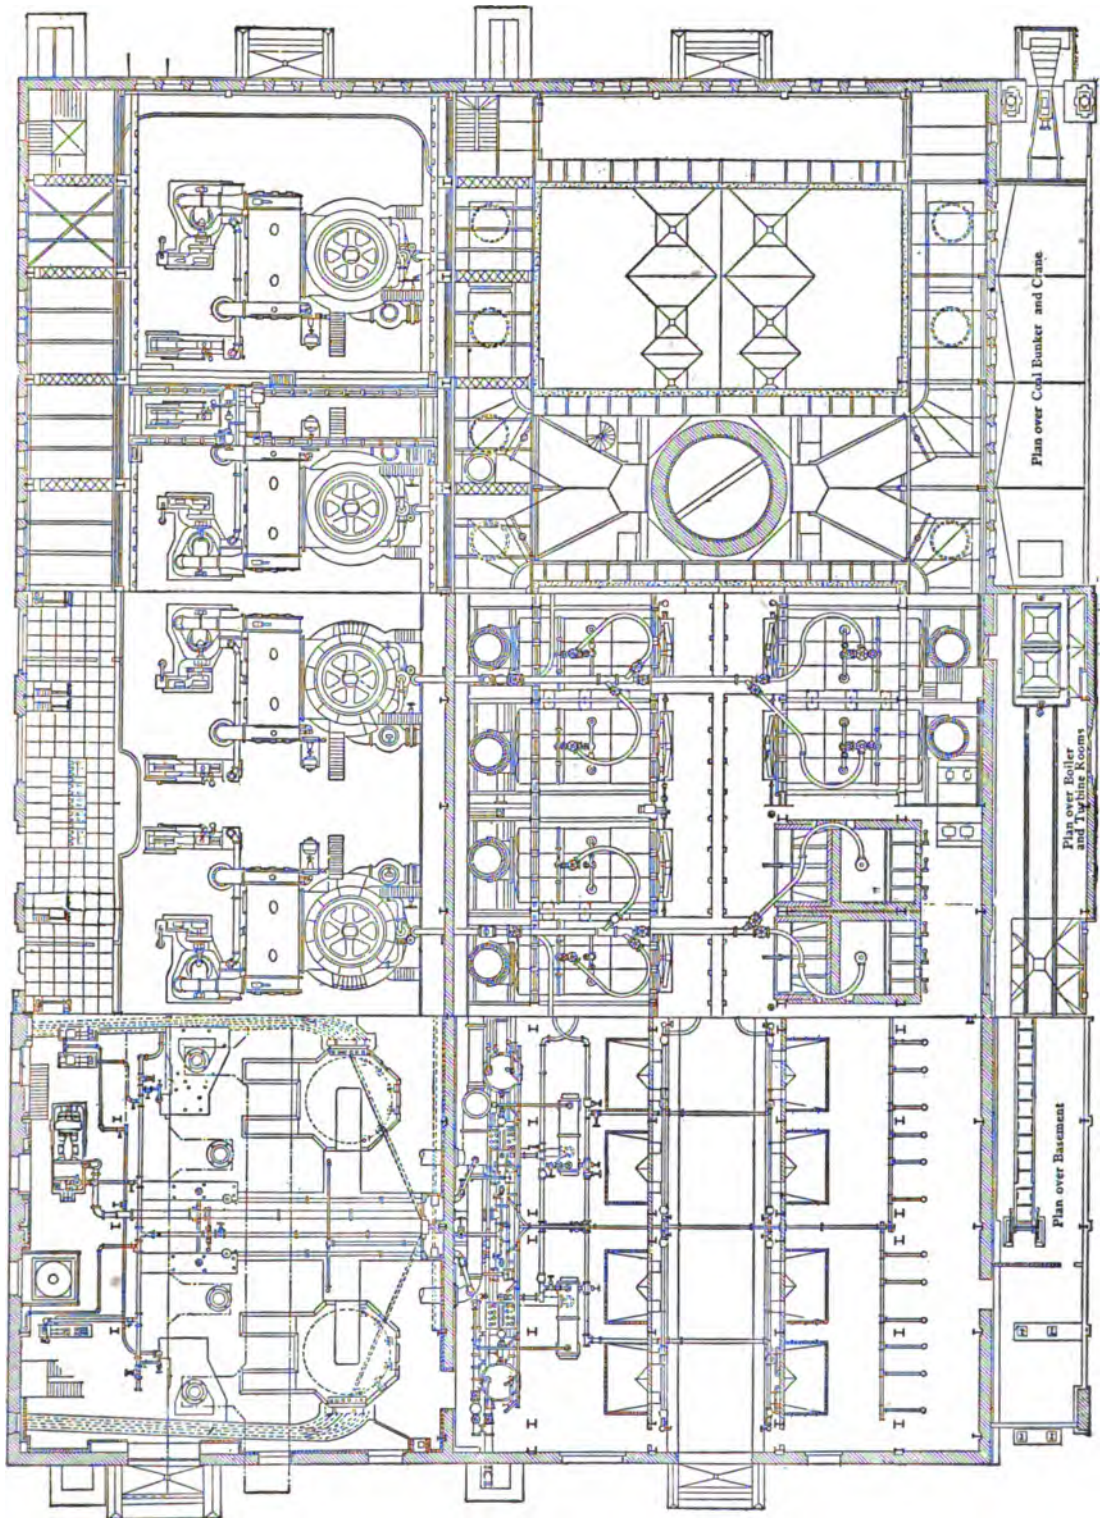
Plan of Port Morris Plant of the New York Central and H.R. R.R. (*Power*).
